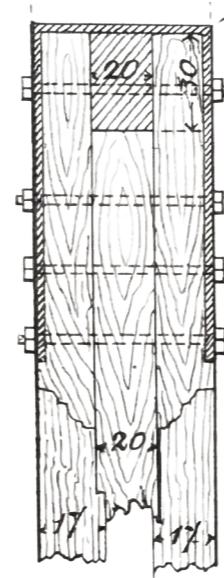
Timber tension rod connection (section view)(Henket et al., 1889)
